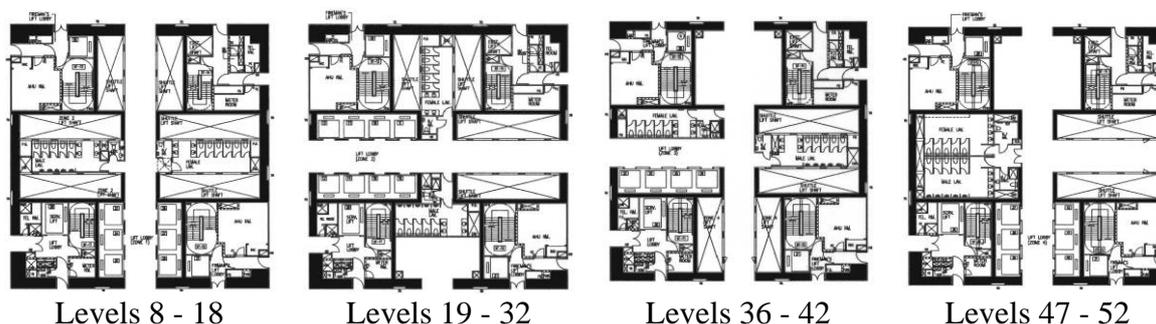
Geometry of Typical Floor Plans of Super Tall Buildings
